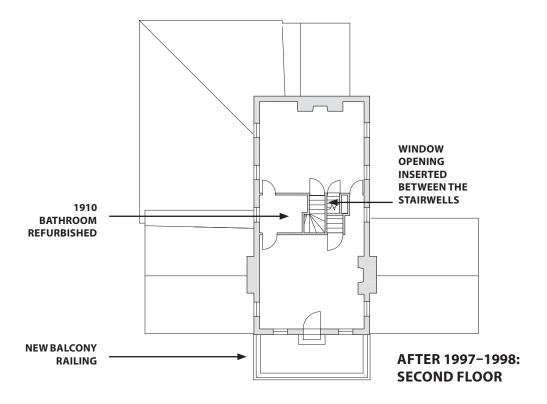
(Left and above) Floor plans of the main house after 1997-98 renovations.
